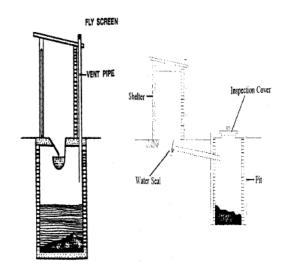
Pour-Flush Latrine with Shelter and Offset Pit
